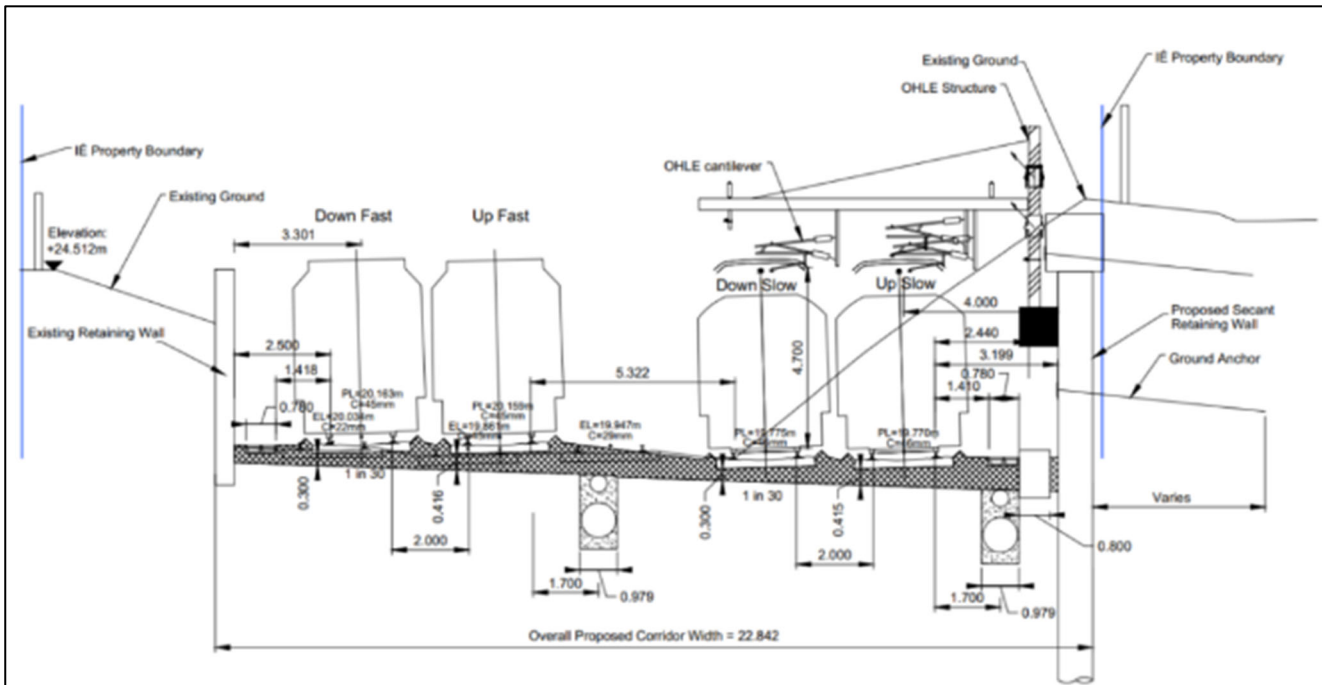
Secant Pile Wall & Ground Anchors – Facing West
